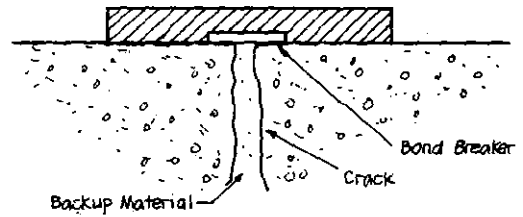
Flexible surface sealant can be used over narrow cracks subject to movement, if appearance is not a consideration. Note bond breaker over the crack itself.
